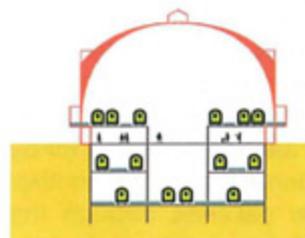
Cross section of the tunnel structure in its final state at the level of the Belgiëlei, where underground double railway lines diverges, two of them going to the track levels -1 (on the left, west side) and two to the level -2 (on the right, east side).
